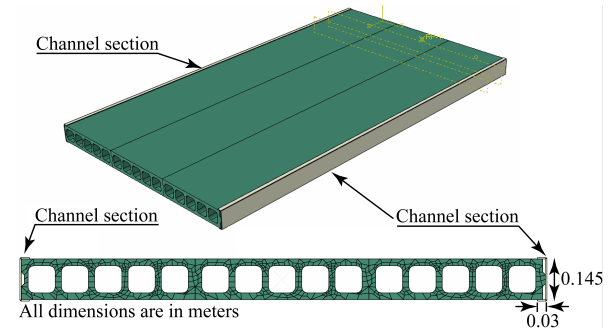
Proposed connection details of the panel assembly; 3D view (top) and section view (bottom)
